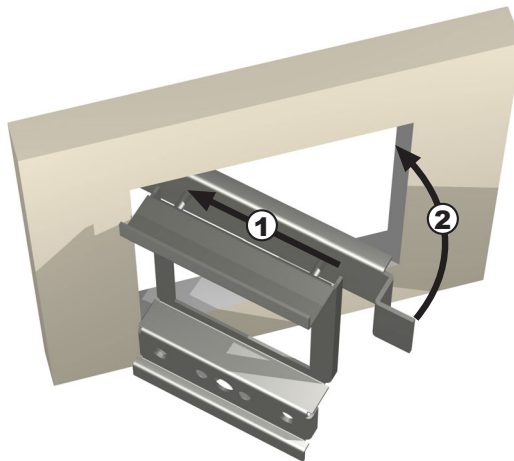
Installing the MRC88 Keypad mounting bracket in the wall
